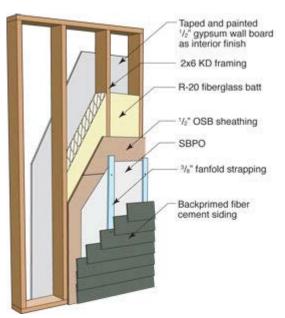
North/South Wall 6 – drained and ventilated, no poly
